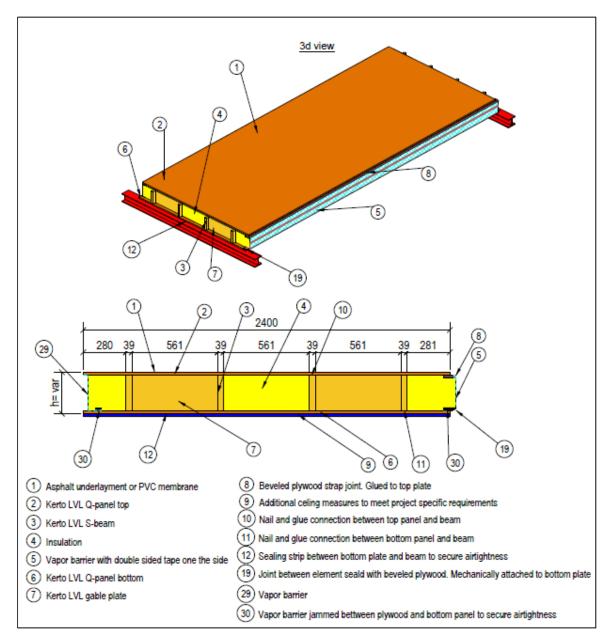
3D view and cross section of Lett-Tak wood (LTW) roof element.
